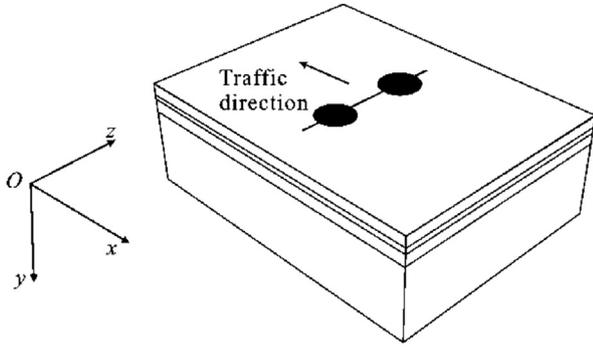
Pavement structure geometry and load mode (Liu et al., 2014a).
